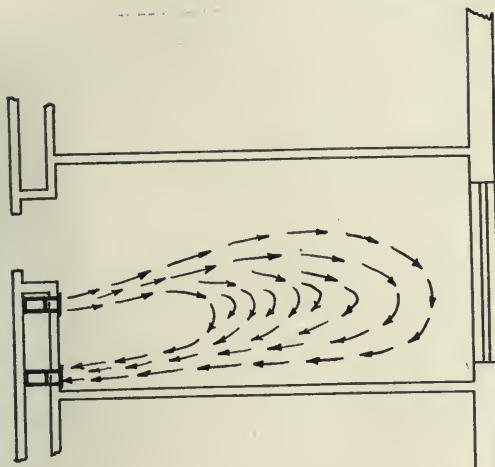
Plan of schoolroom showing effect of locating supply and exhaust openings near one corner of narrow room.
